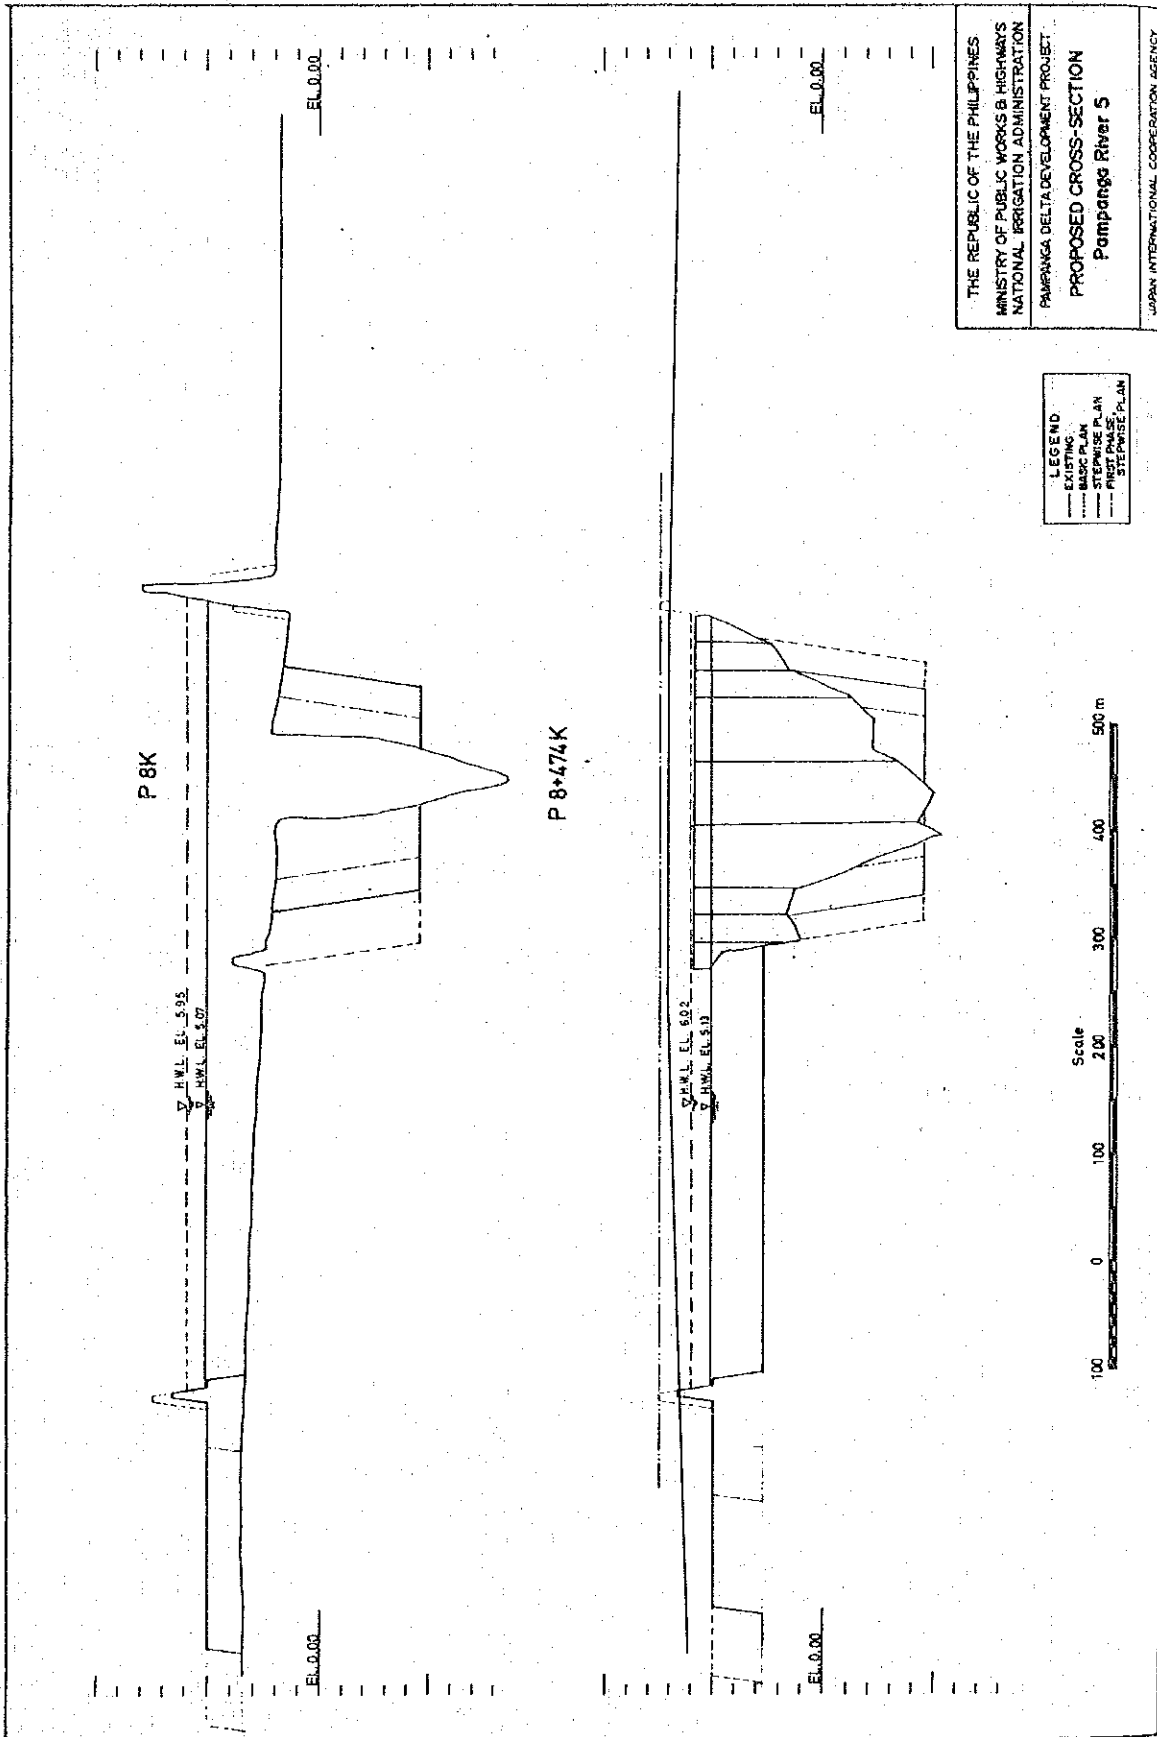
(6) PROPOSED CHANNEL CROSS-SECTION
